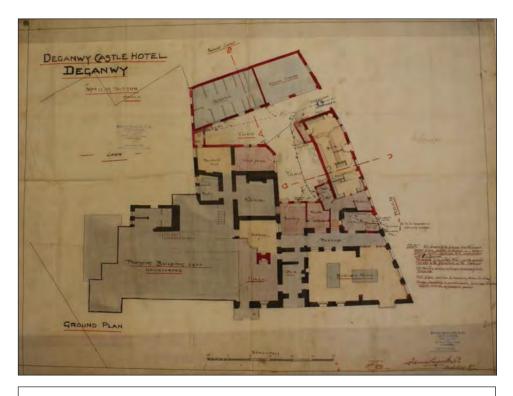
Proposed Modifications to the Deganwy Castle Hotel 1898. Note the Existing Building in the Footprint of the 1919 Wing. Source: Conwy Archives Doc C Maps & Plans 23/1/131
